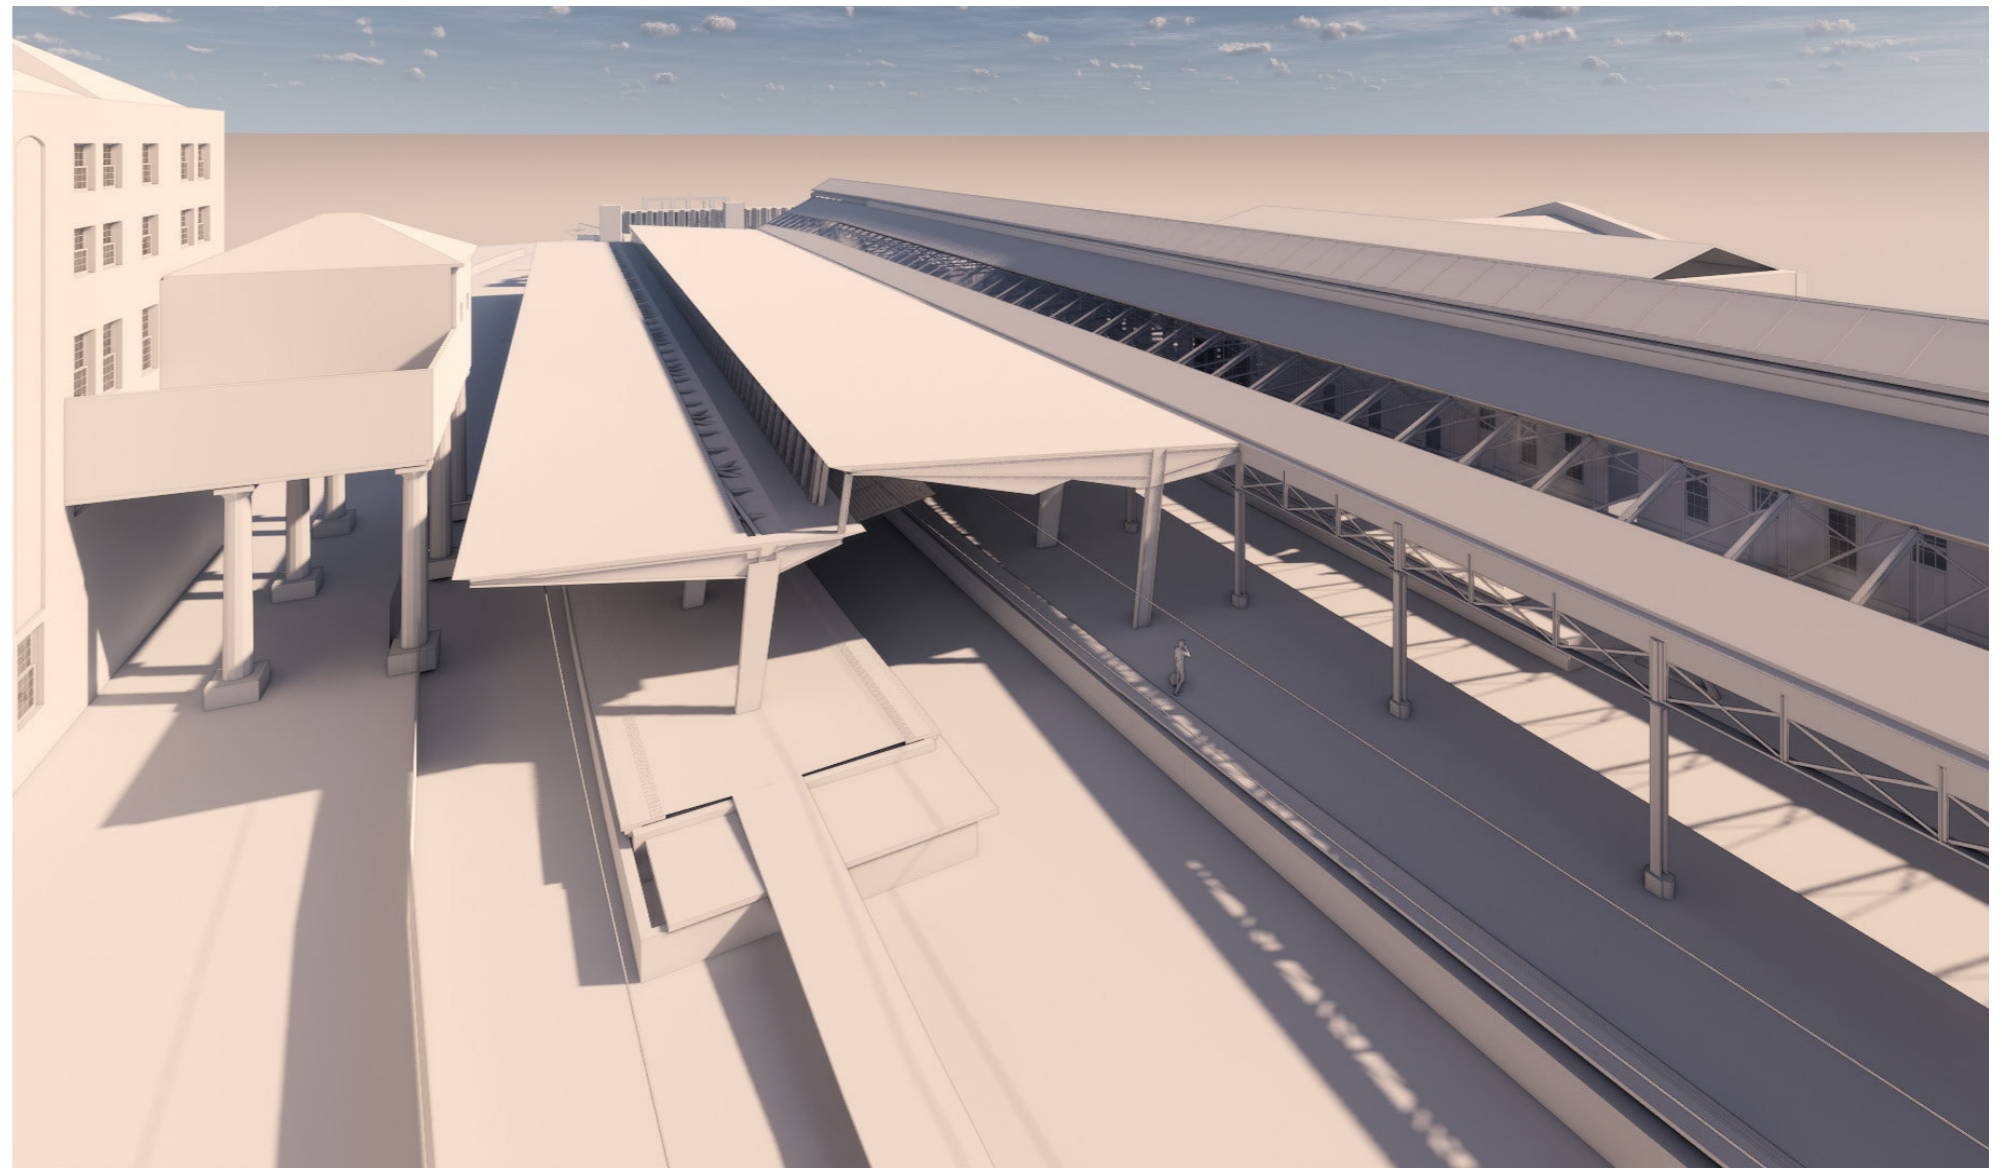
Aerial view showing descending hierarchy of roof forms from Roof A to the proposed new roof
